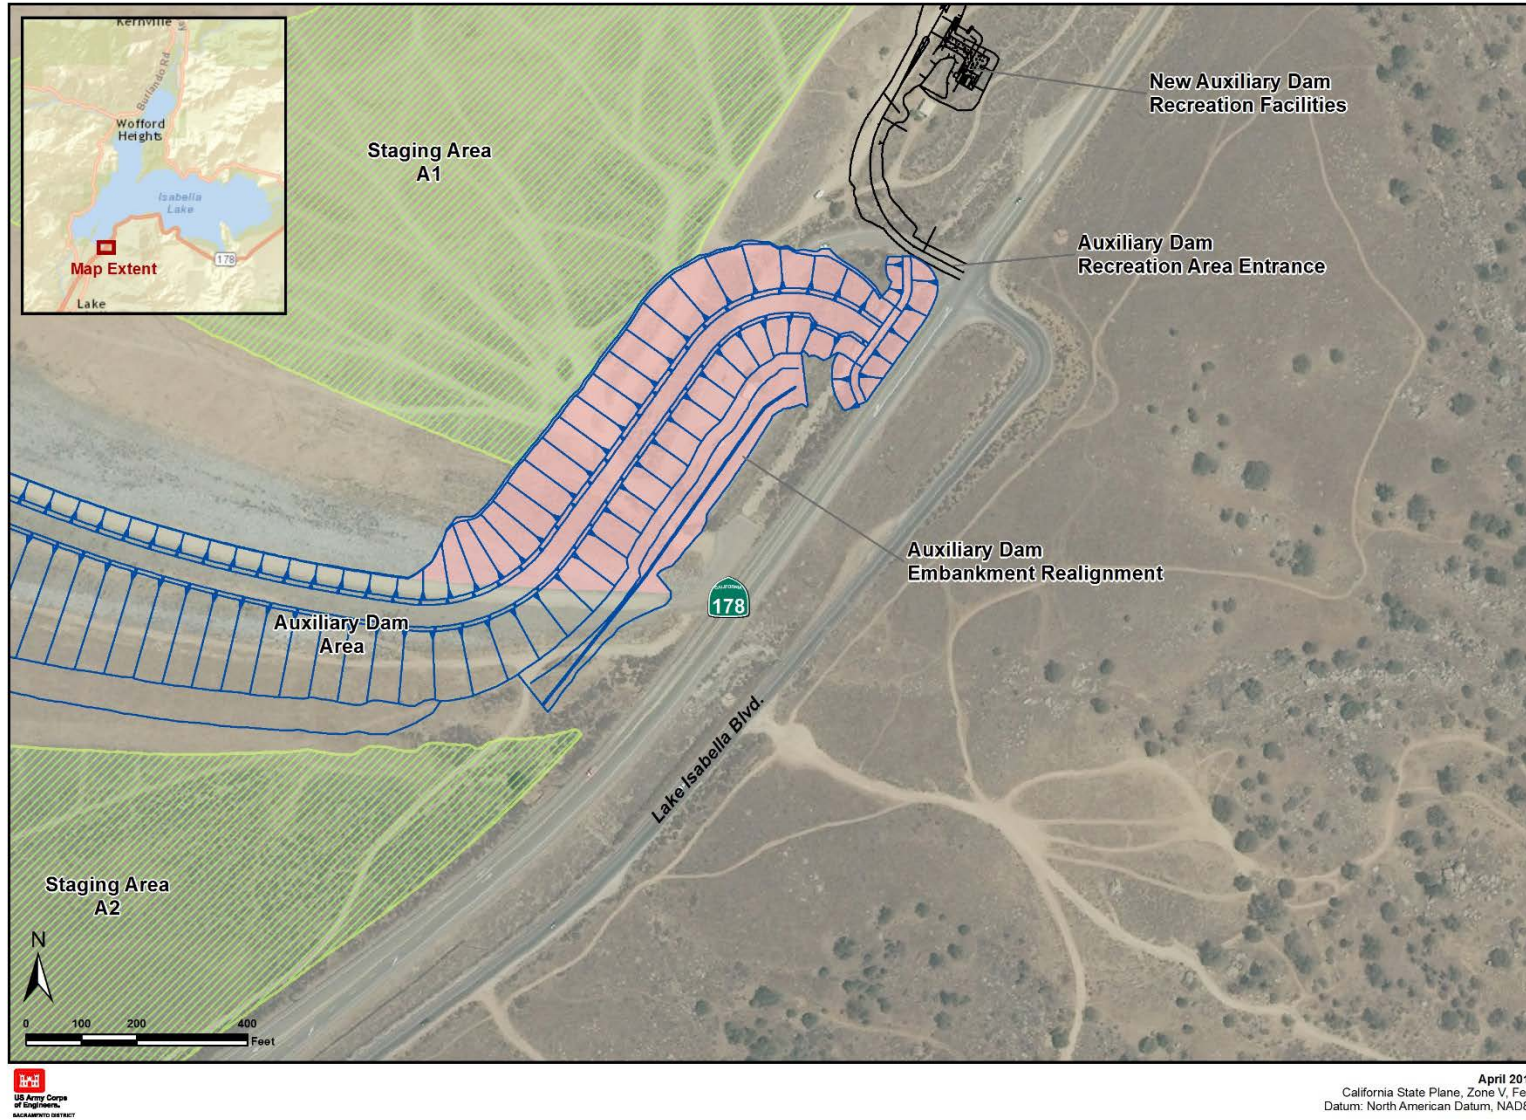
Auxiliary Dam Left Abutment Embankment Design Refinement.
